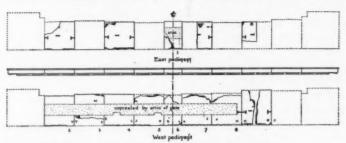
PLAN OF EXISTING GEISA OF PEDIMENT FLOORS.
